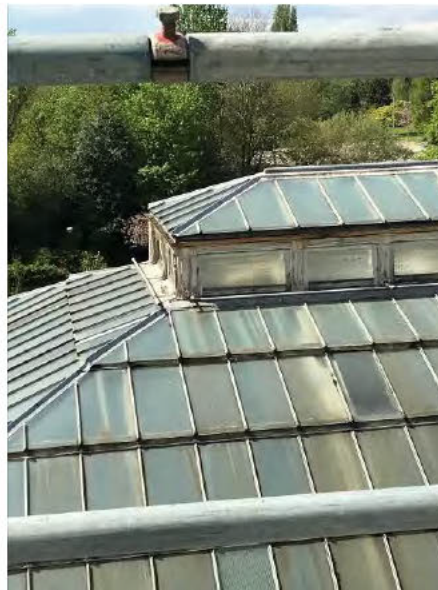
The Tropical Room: Rotting timber to roof cupola. Damaged glazed panels throughout roofing structure.
